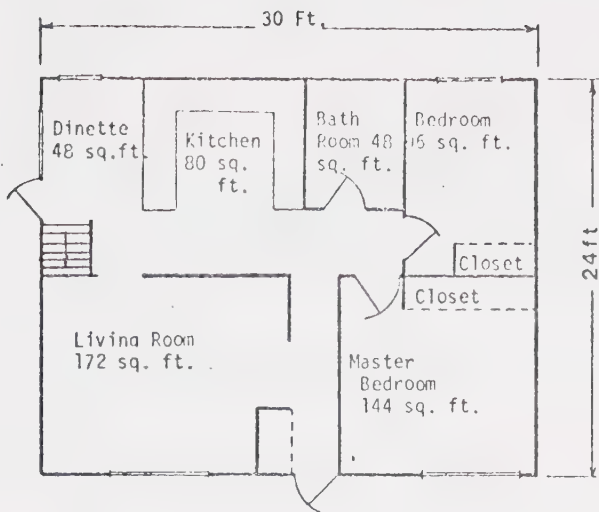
Basic Floor Plan of 720 Square Feet
